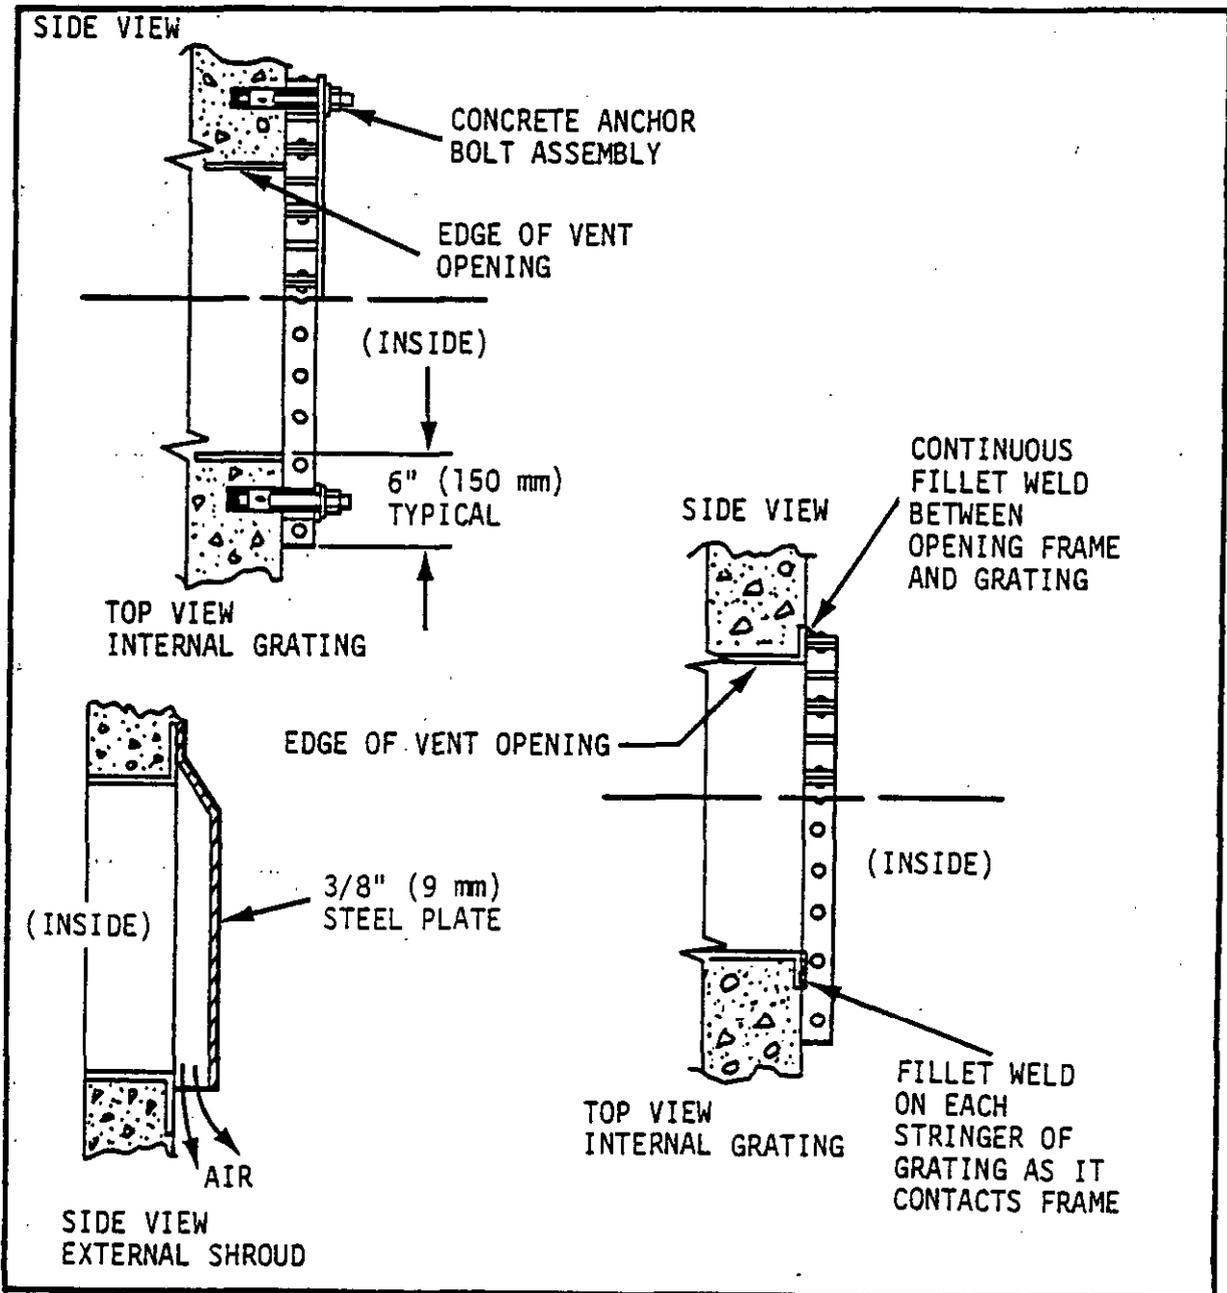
Installation details of hardening a typical riveted steel grating and shrouded louver.
